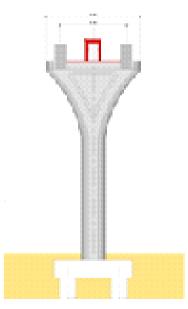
Supporting Structure Example for a two lane elevated deck for MNT Guide Beams. Source: MECCA, 2013.
